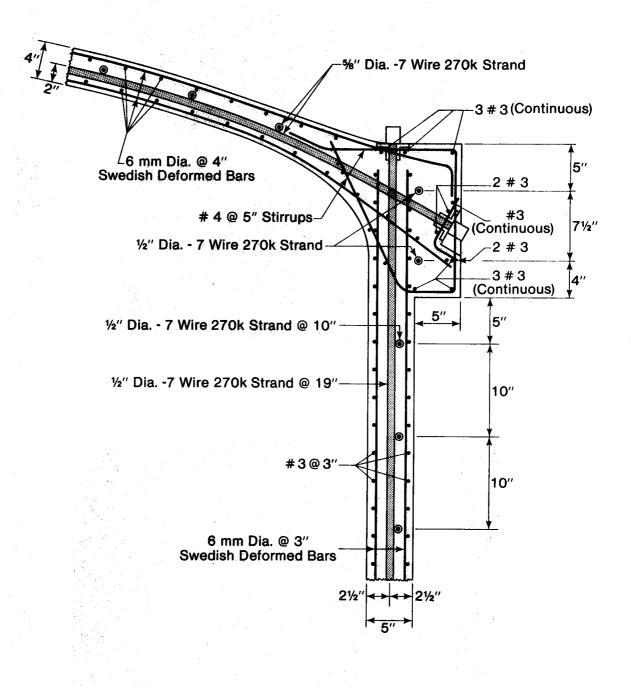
Reinforcing Details in Wall, Ring Beam and Dome
